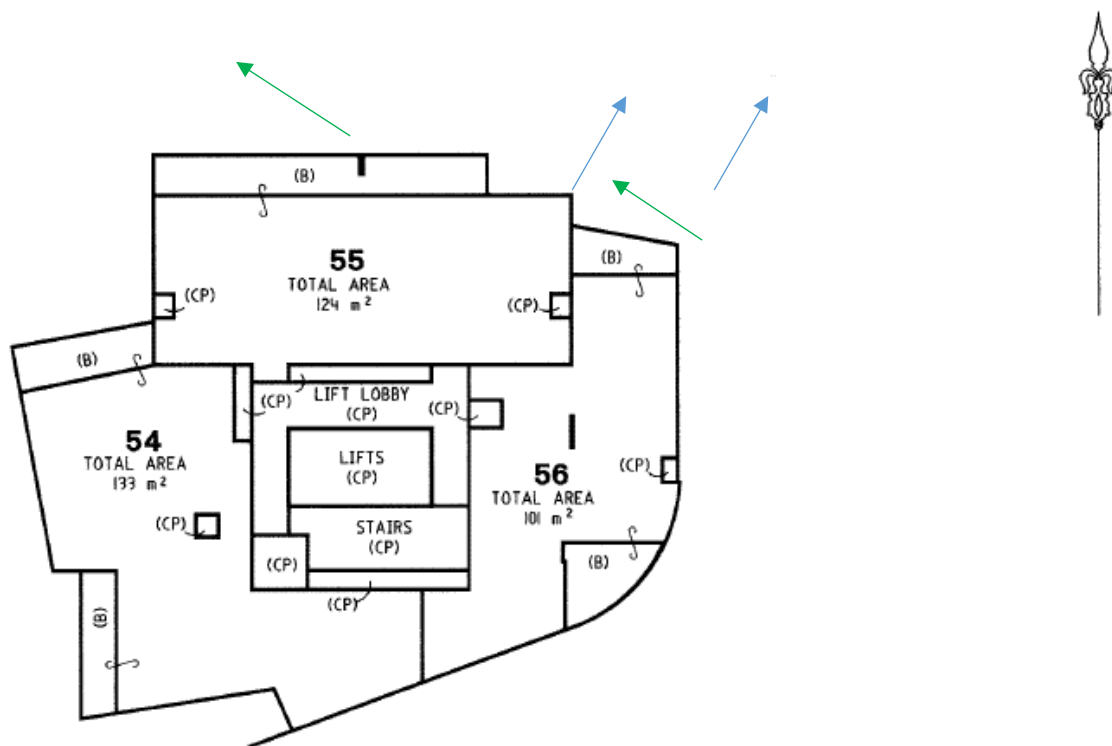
Strata Plan layout (typical) of Levels 13 and 14, at 417-419 Bourke Street, Surry Hills
